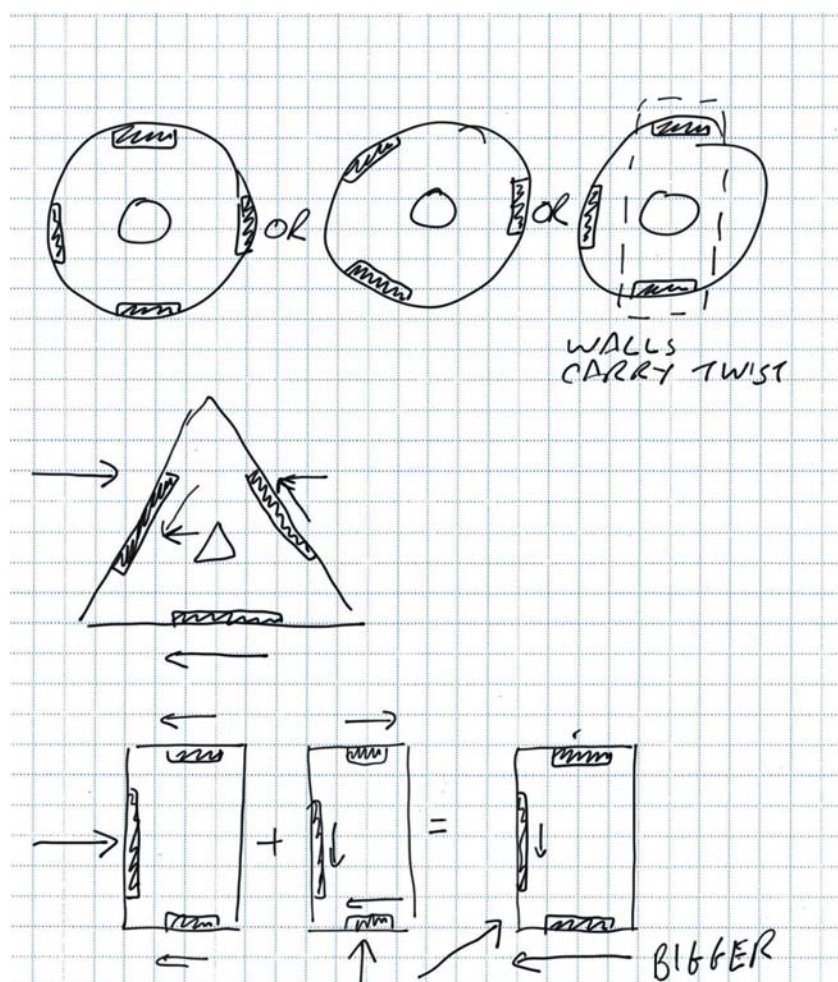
shows three types of building. For circular buildings with two orthogonal sets of walls, the design approach is the same as for rectangular buildings, but with a revised pressure profile. Where non-orthogonal walls are provided, the wind needs to be considered from all 12 directions to ensure the worst load case is considered for each wall. Where walls are orthogonal but only one wall is provided in any direction, then as with rectangular buildings we need to consider the additional load from the twist as well as the significant reduction in redundancy.
